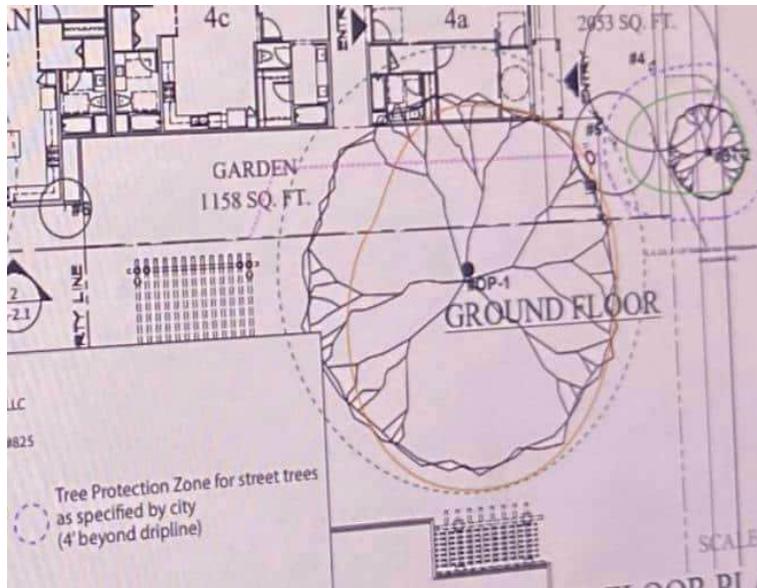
Tree shown with Root Protection Zone as shown on design submittal. Dotted line is on ground floor- that is different from the foundation level wall that extends outwards and further encroaches into the designated Tree Root Protection Zone (see next Figure).
